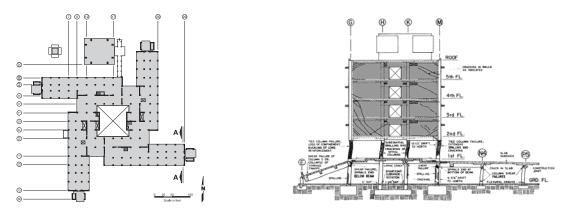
First floor layout of the main buildings of the Olive View Hospital and Schematic Diagram (by L. Hashizume, E. Loh) of damage to frame 29.
